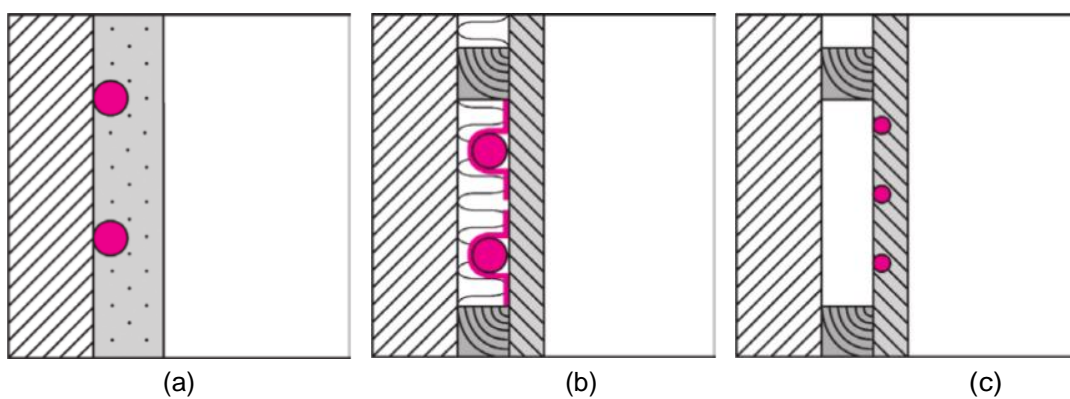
Vertical sections: (a) Pipe system in wall plaster; (b) pipe system in substructure with drywall board; (c) pipe system in drywall board wall (from: [3])
